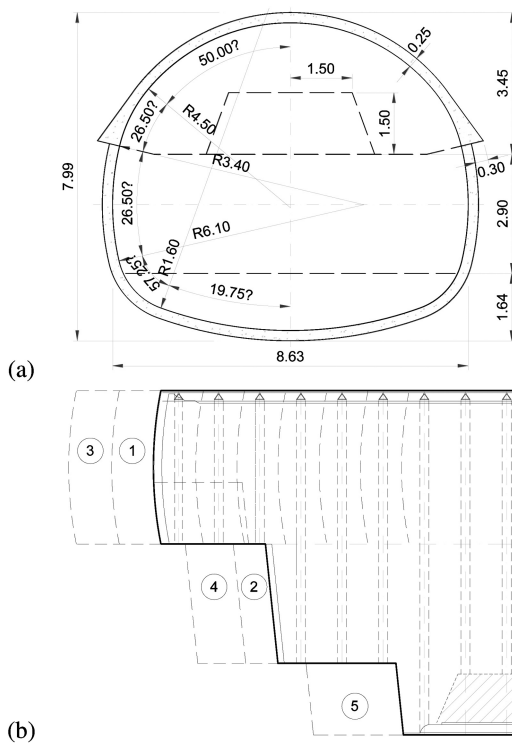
Geometry of the double track tunnel in the northern sector of Line 2: a) cross-section and b) construction sequence.
